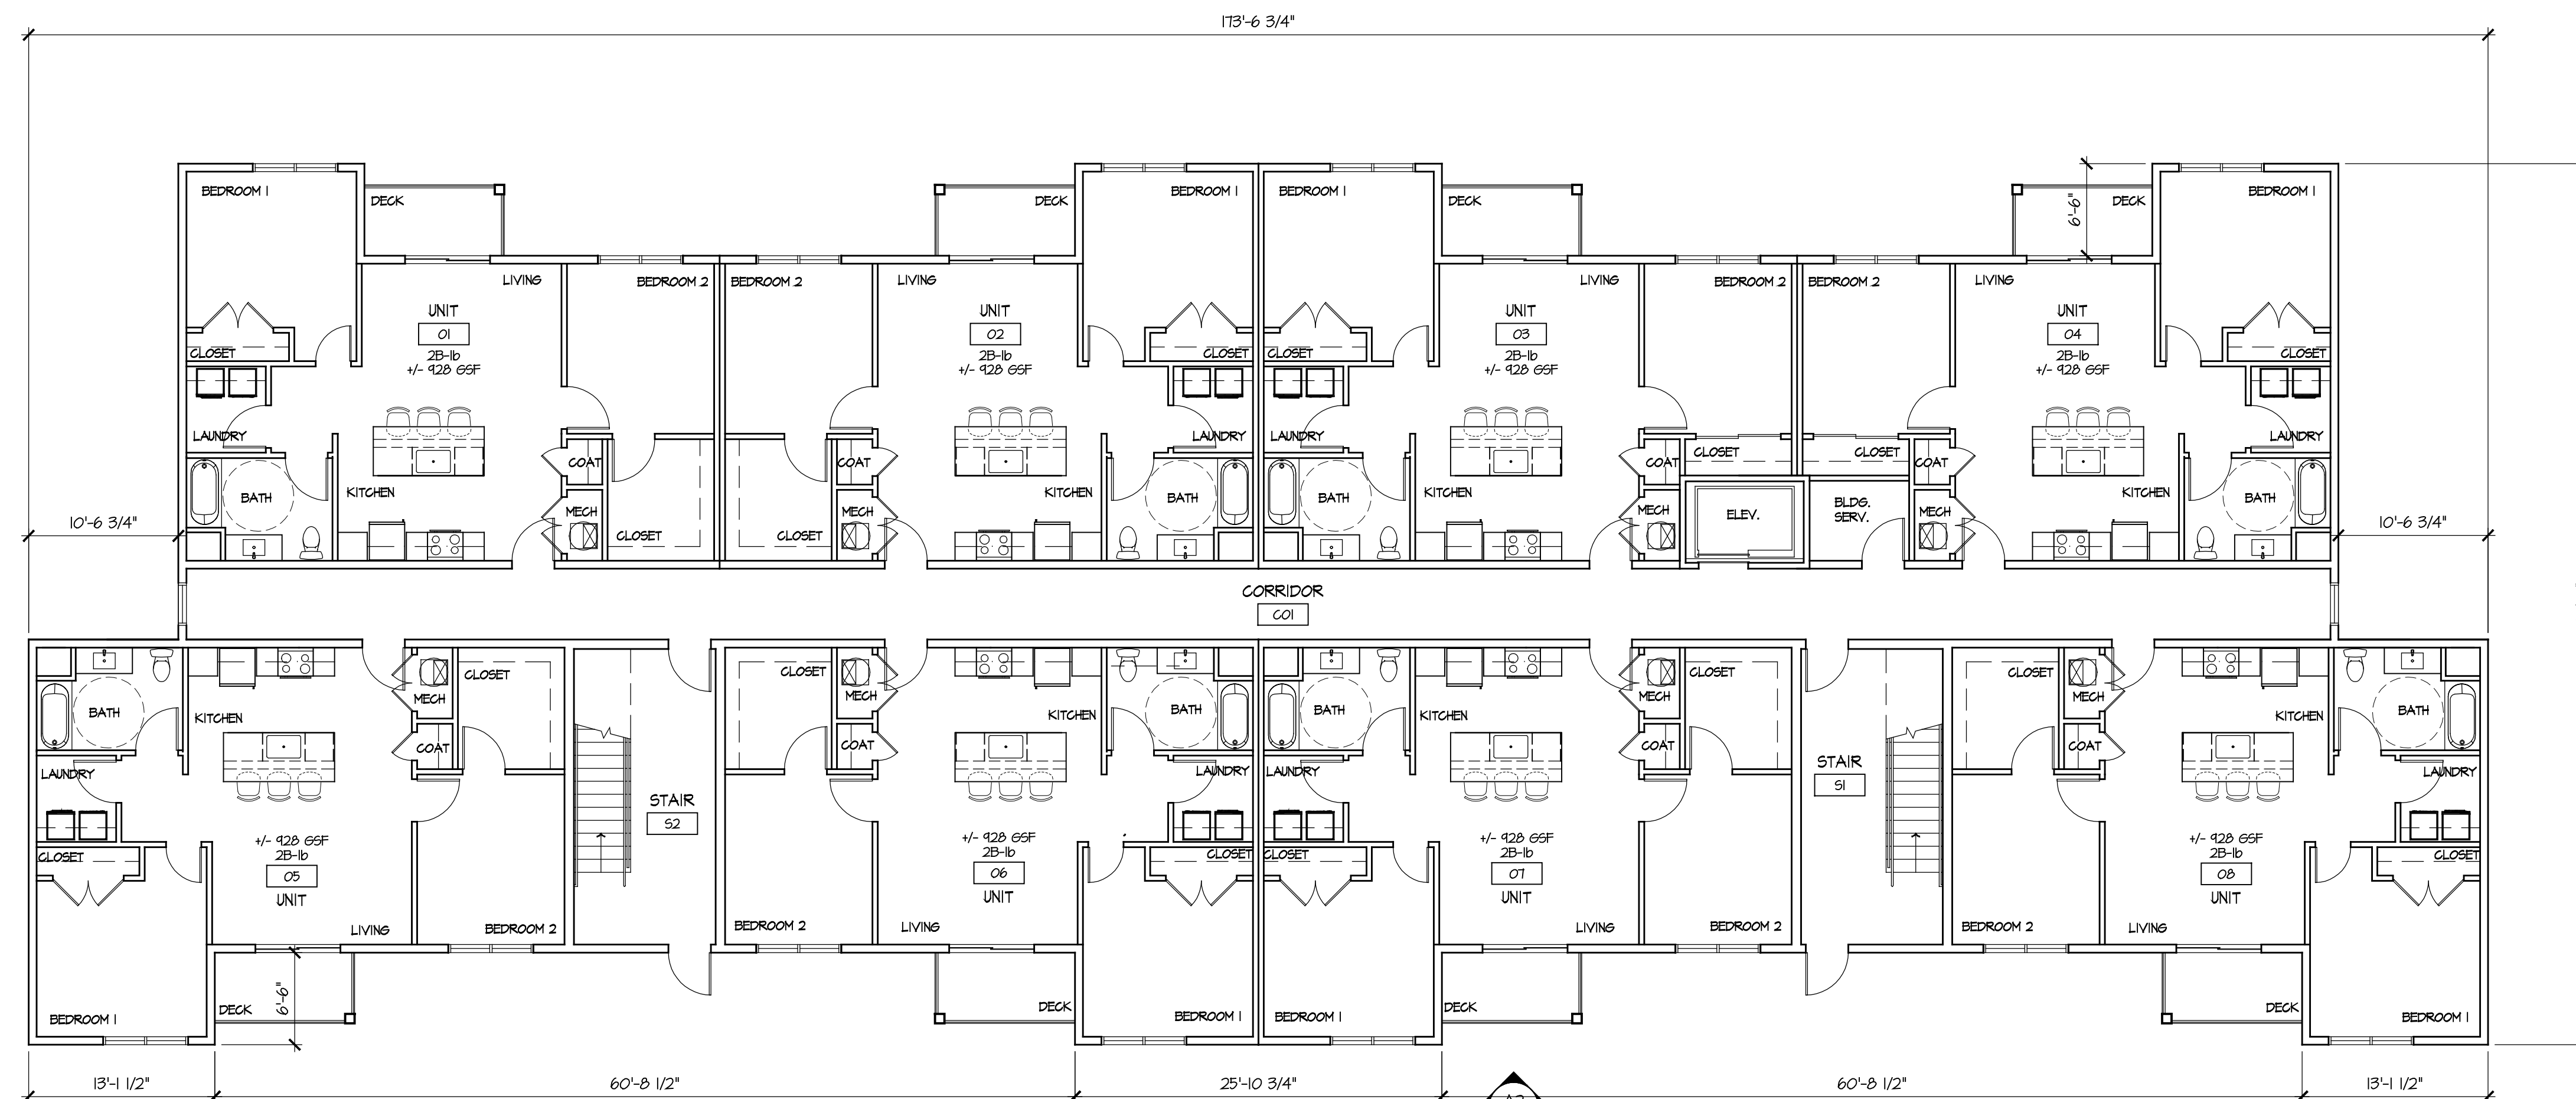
Typical Apartment (Building A) Floor Plan
